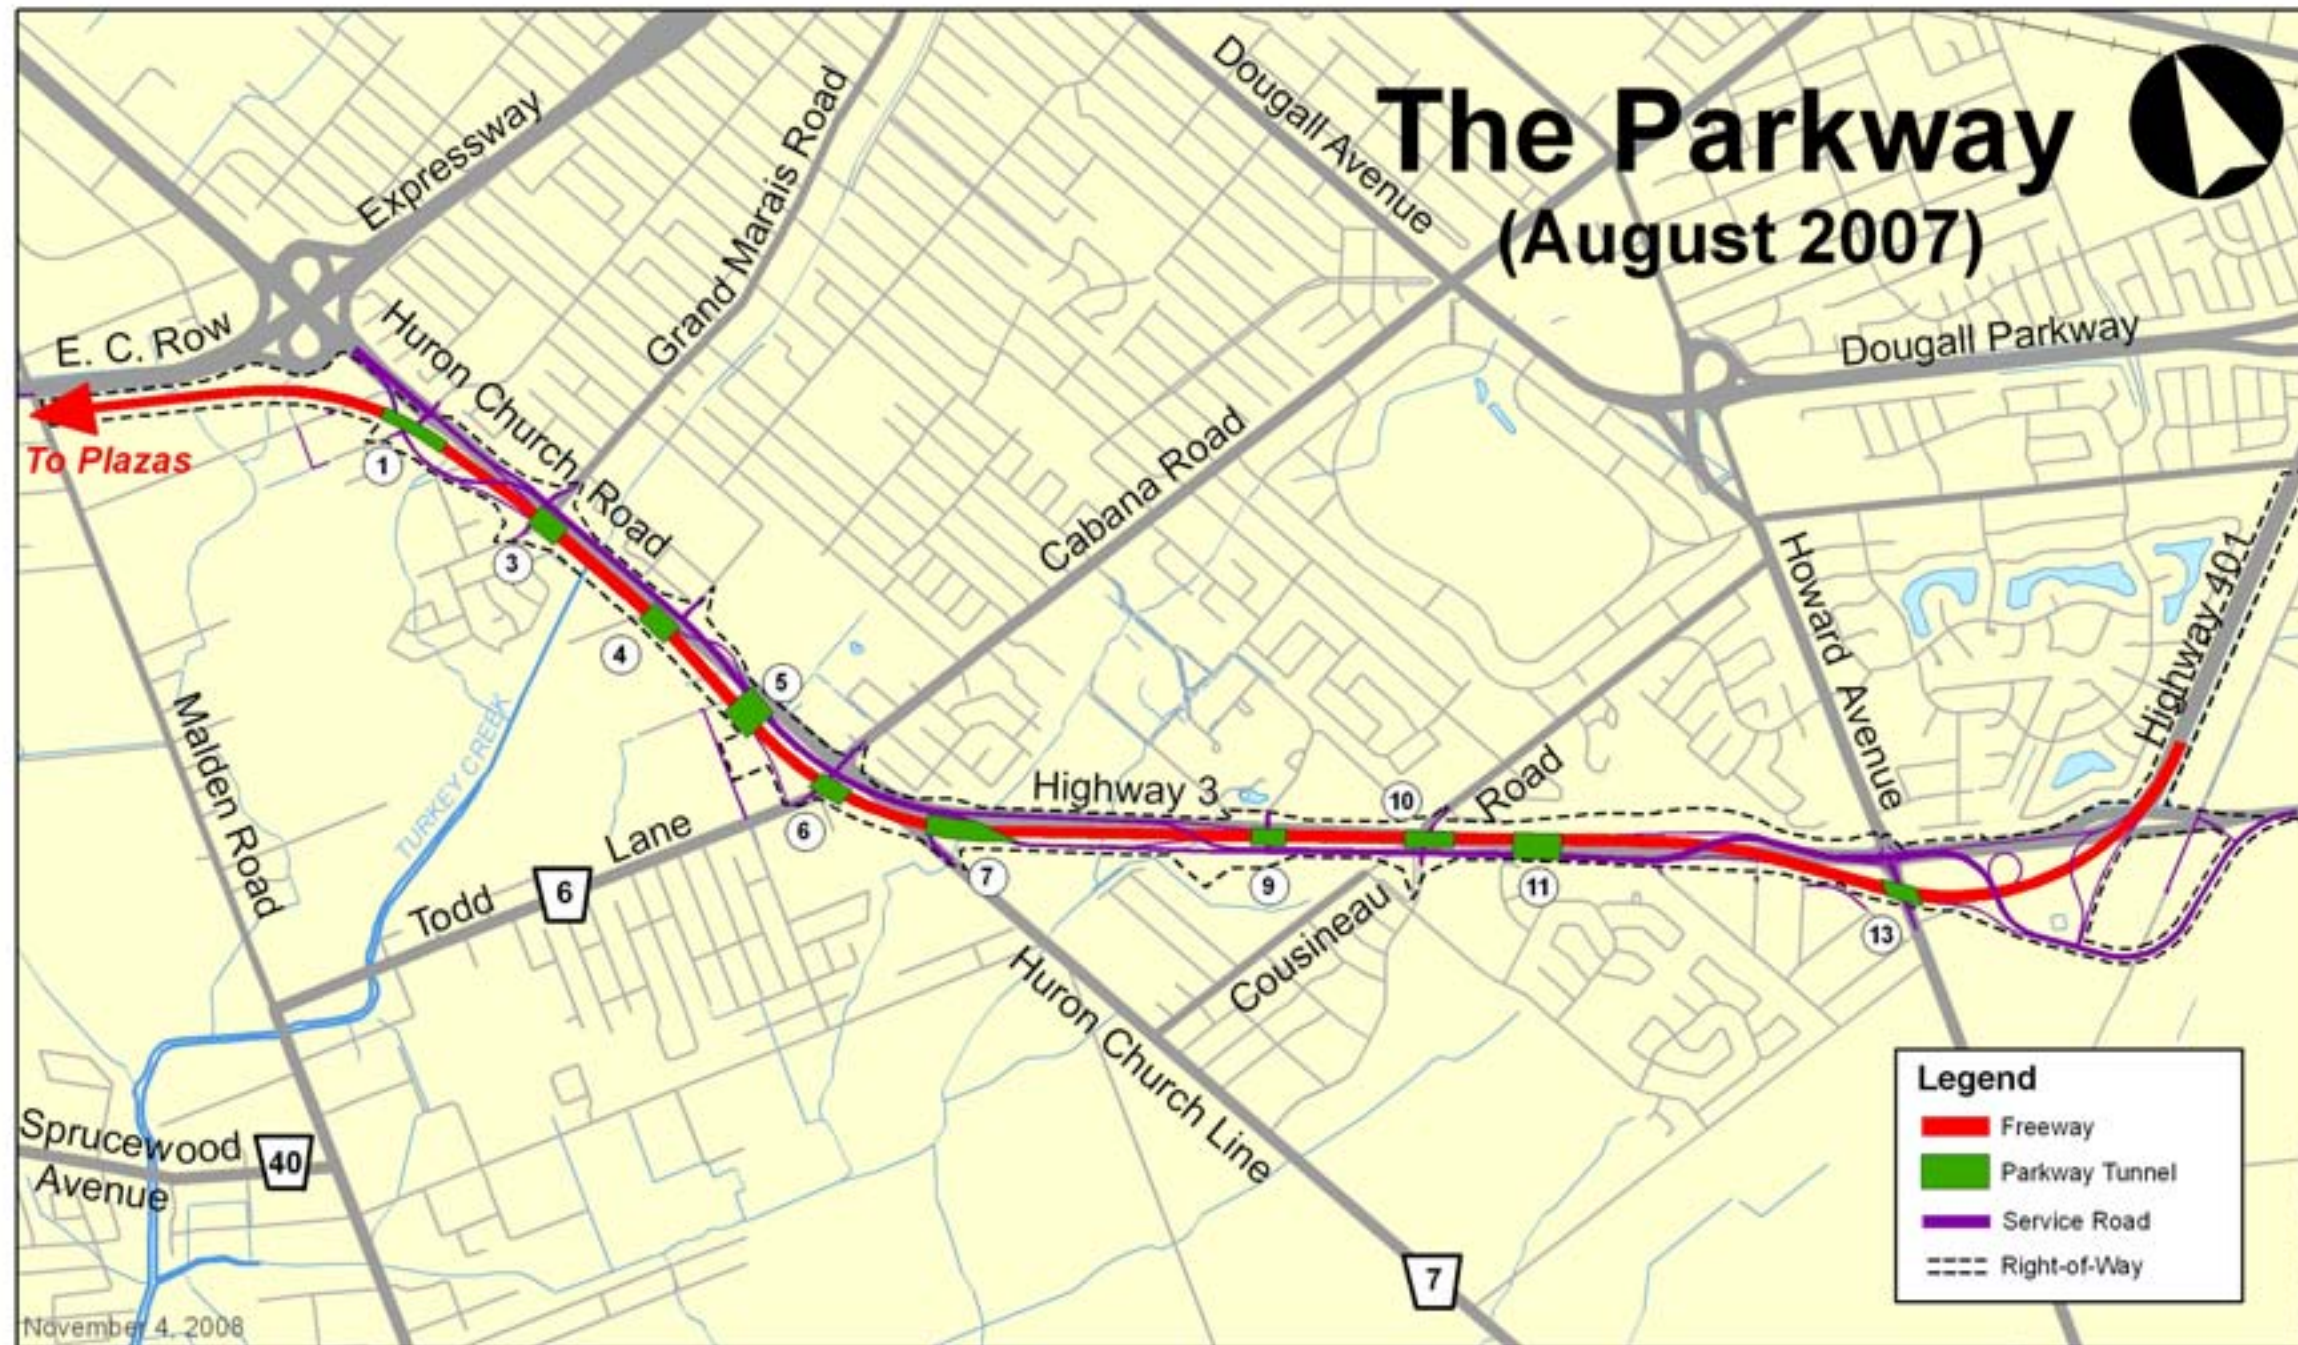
B – PRACTICAL ACCESS ROAD ALTERNATIVE 3
